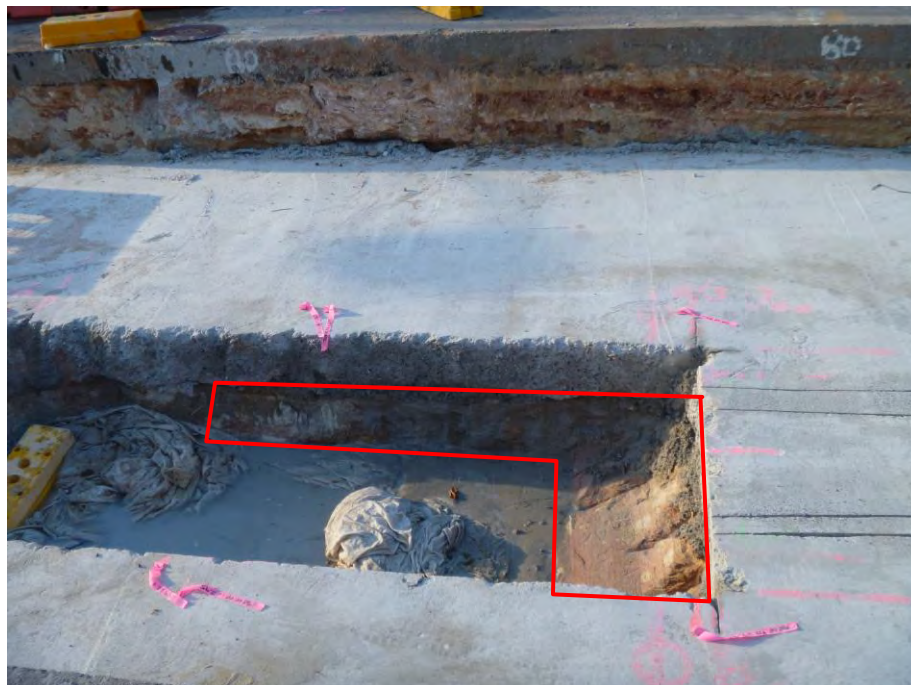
Ripped sandstone filling over medium strength sandstone at about 1 m below High Street pavement.
